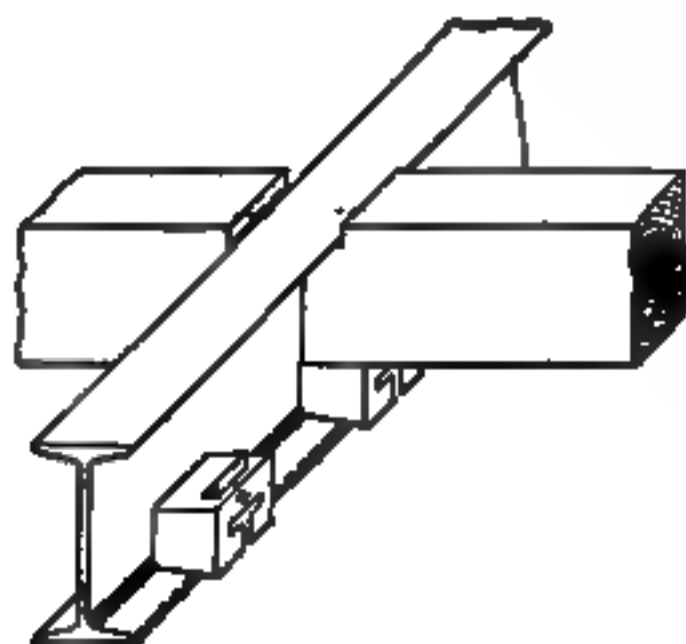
Wooden Beam Framed to I Beam with Duplex Box-hanger
